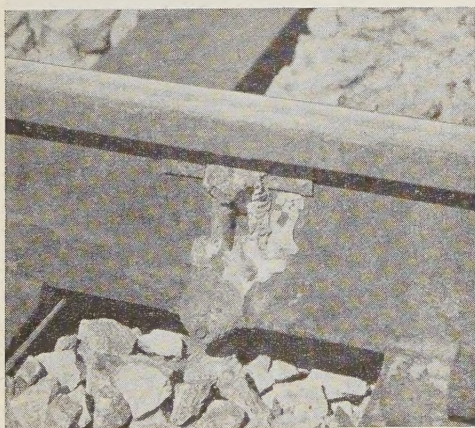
Close-up view of a thermit-pressure weld. — Delaware & Hudson Railroad.
